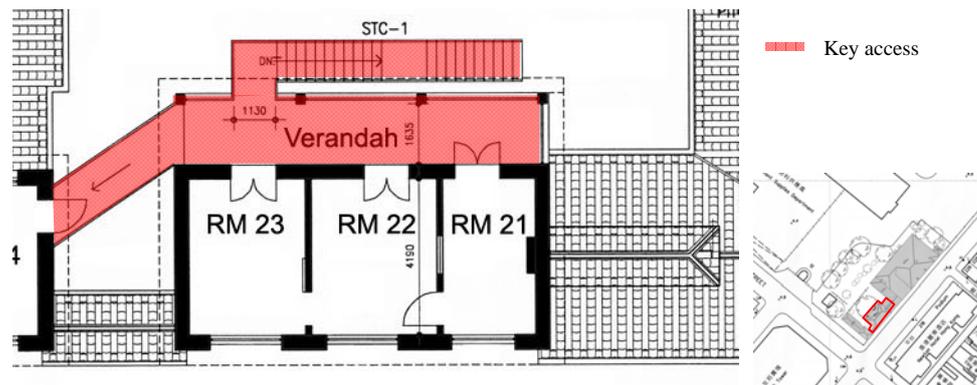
Existing first floor plan of Annex A at No. 12 Oil Street, North Point (1:200).
